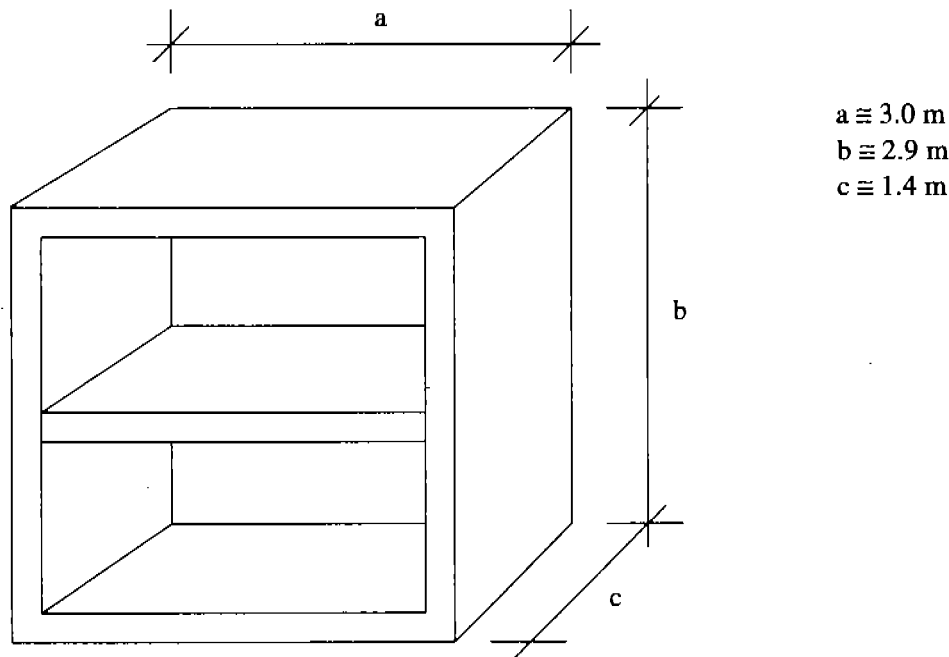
Test arrangement in the laboratory, consisting of walls, ground floor structure, intermediate floor/ceiling structure and a roof structure.
